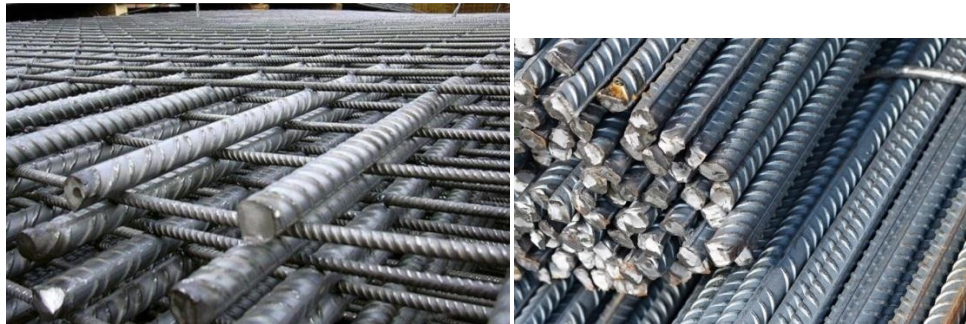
shows an example of Mash Reinforcement and Bar Reinforcement
